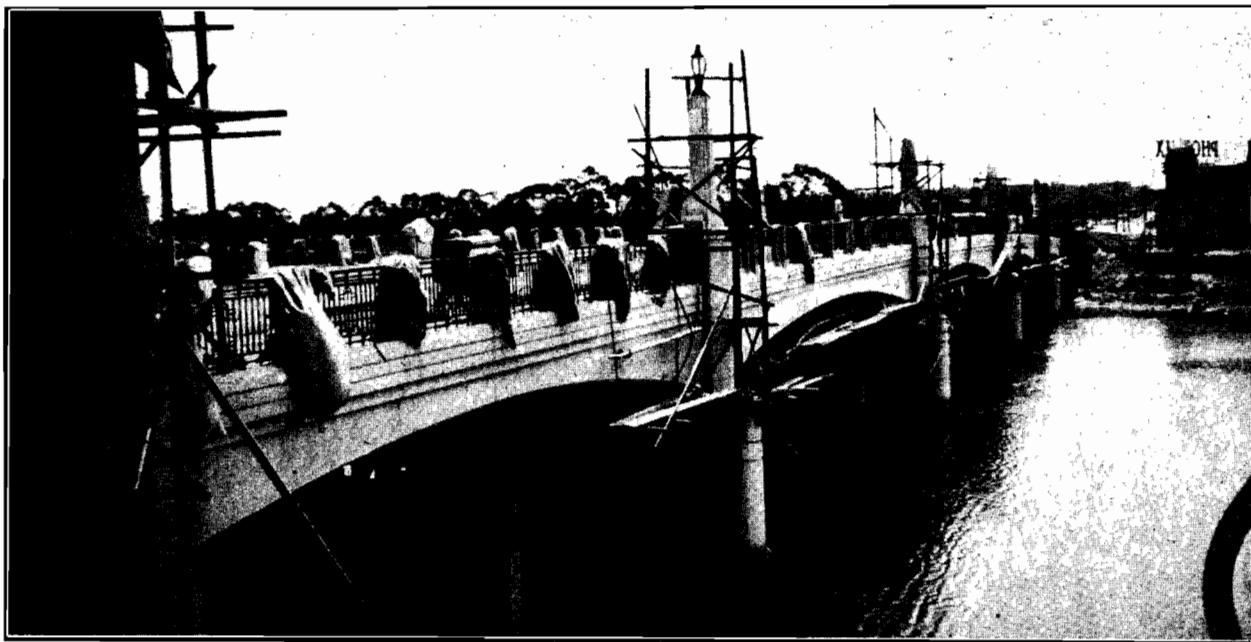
Showing new bridge in the course of erection over the River Yarra at Punt Road.
